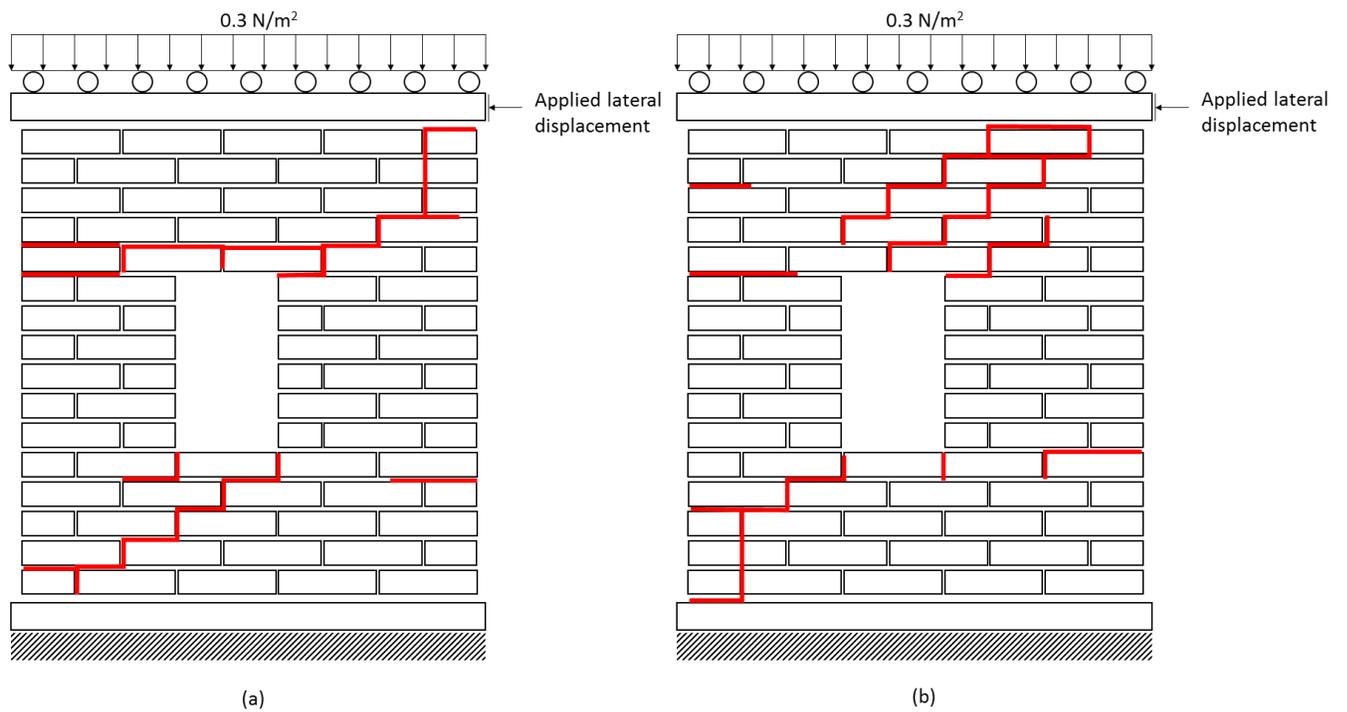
Crack patterns at 4mm of laterally applied displacement, for physically tested shear walls with an opening: (a) test specimen 1 (b) test specimen 2 (Lourenco, 1996)
